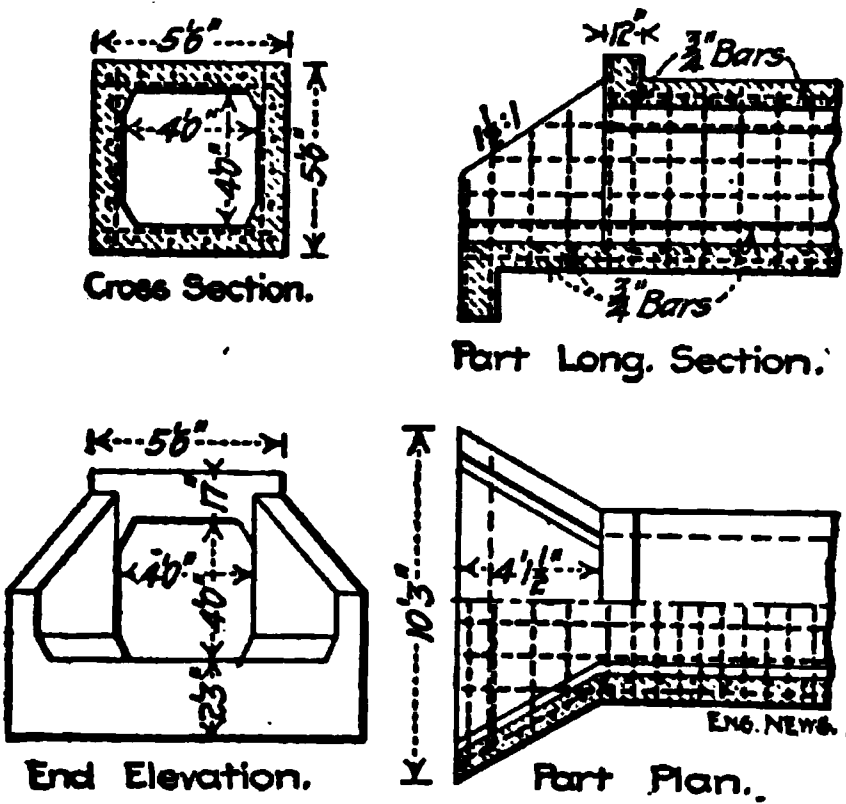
REINFORCED CONCRETE BOX CULVERT, GREAT NORTHERN RAILWAY.
